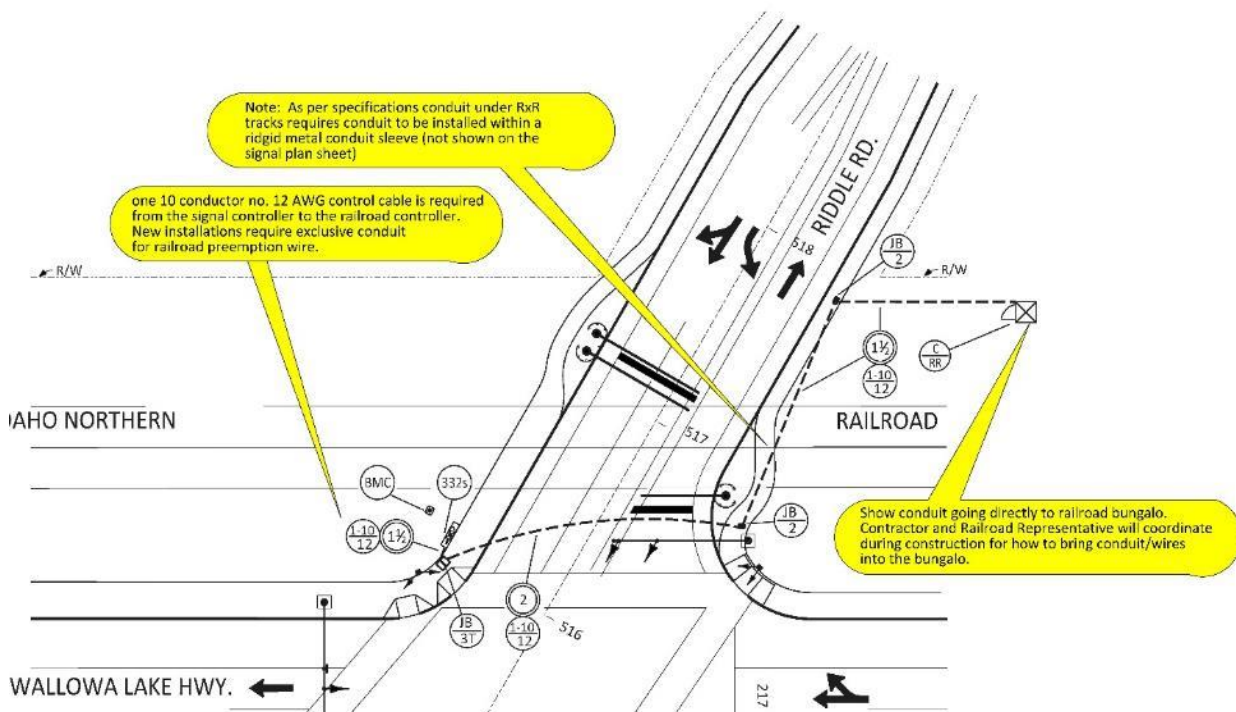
| Railroad Bungalow Access Box for Interconnect Conduit and Wiring
